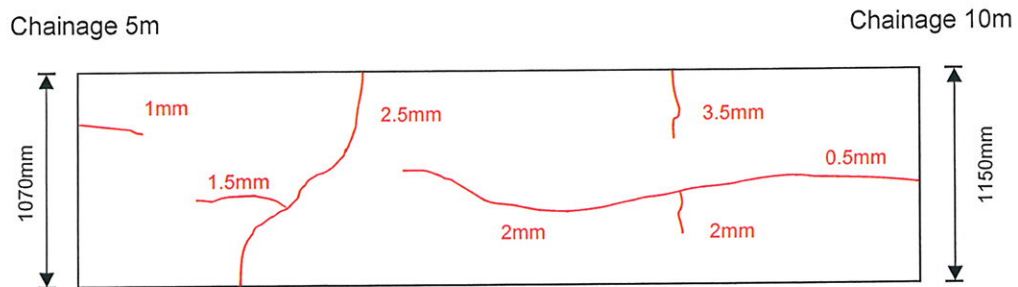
Wall Height, Crack Locations and Sizes for Chainages 5m to 10m
